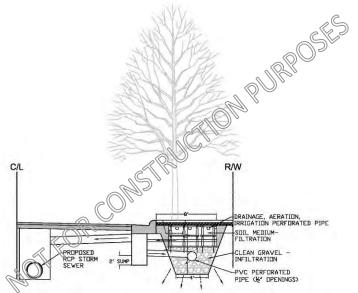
Typical cross-section of a tree box filter adjacent to a parking lot or roadway.
